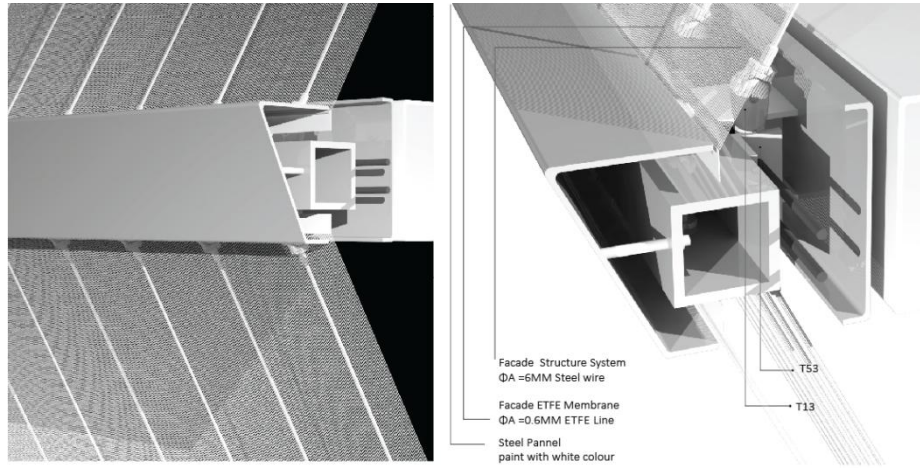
Facade Detail rendering(Left) ETFE Facade joints(Right)
